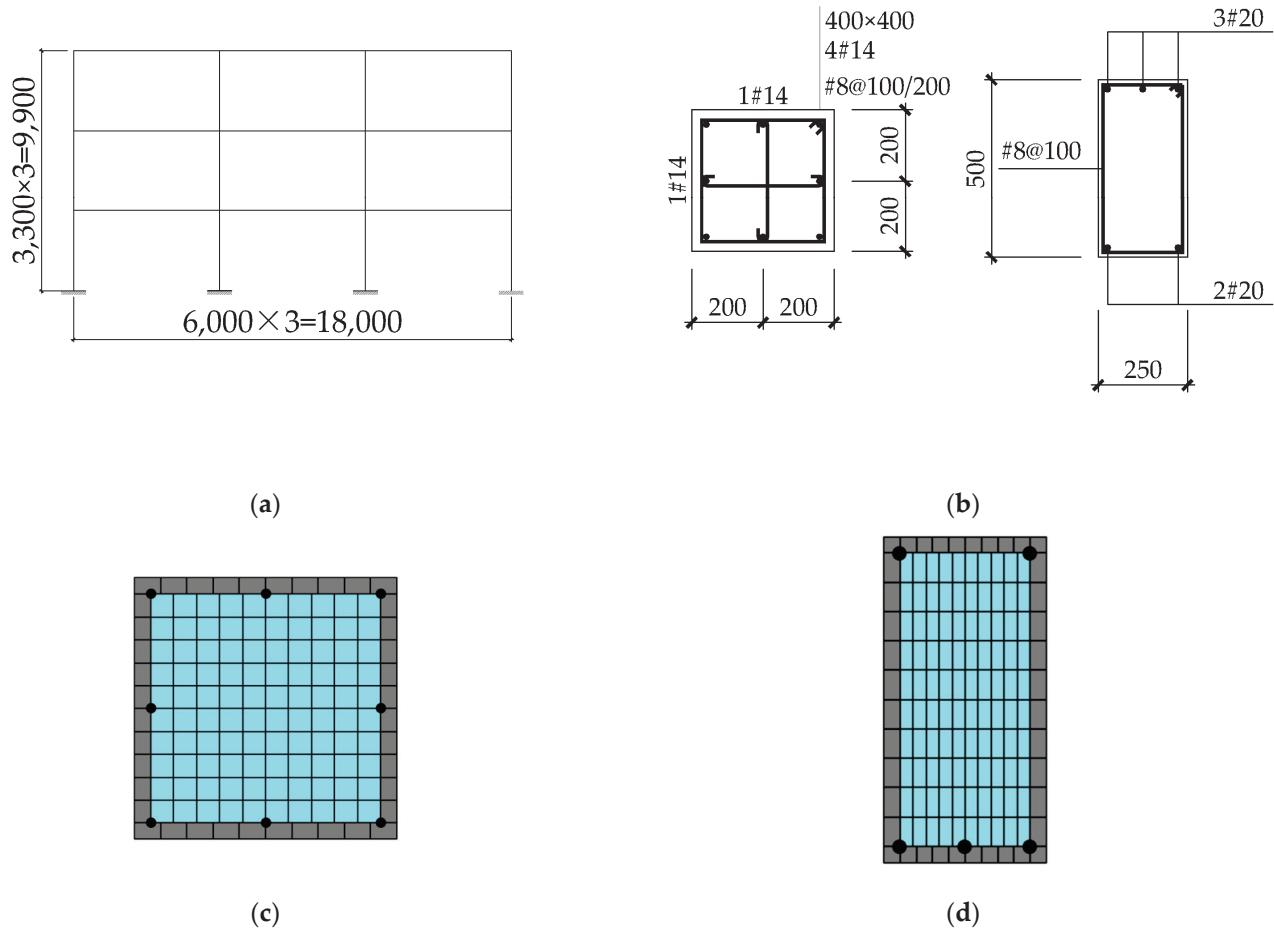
Two-Dimensional RC-Frame Finite Element Structure (unit: mm). (a) RC-Frame Structure; (b) Column and Beam sections; (c) Mesh of Column Section; (d) Mesh of Beam Section.
